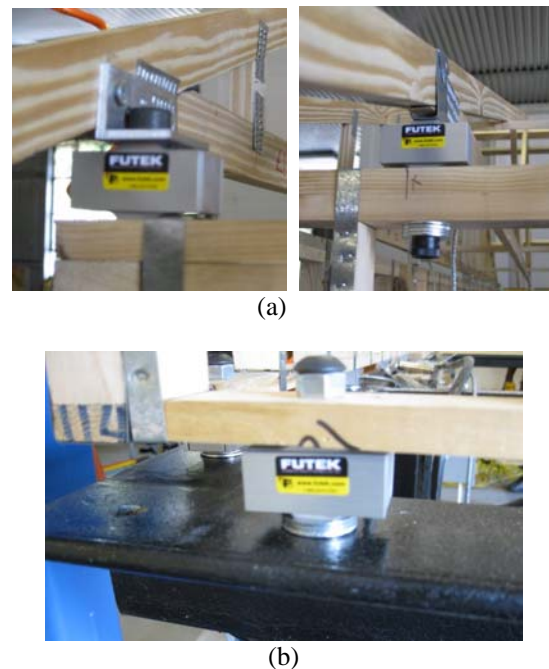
Load cells at (a) roof-to-wall connections and (b) foundation
